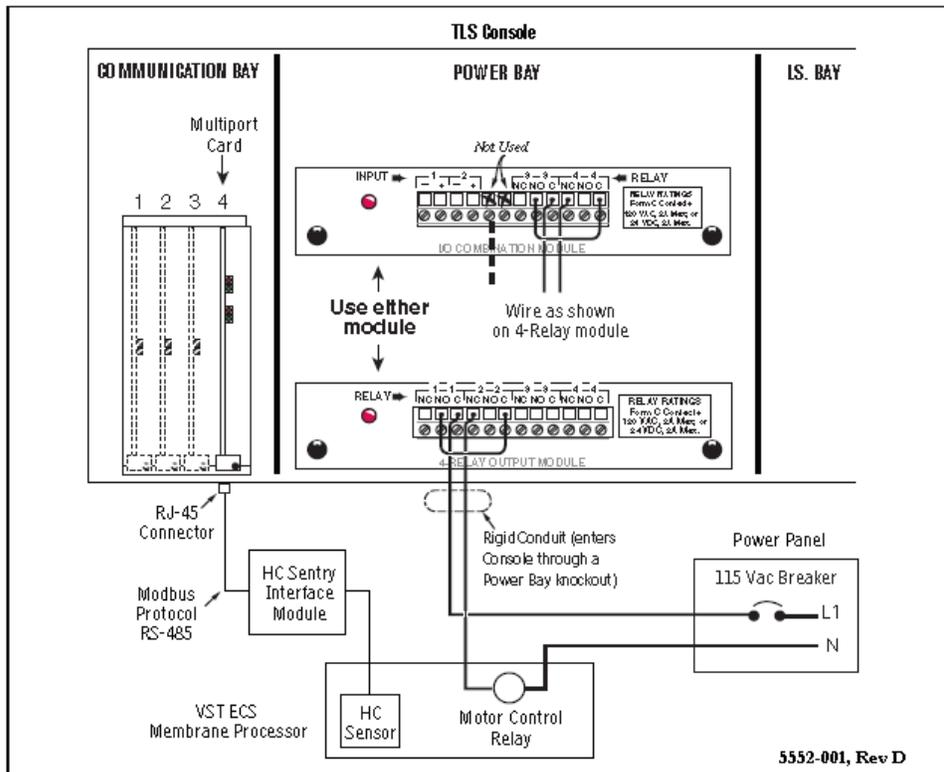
VR TLS Multi-Port Card Connection to the HC Sentry Module
